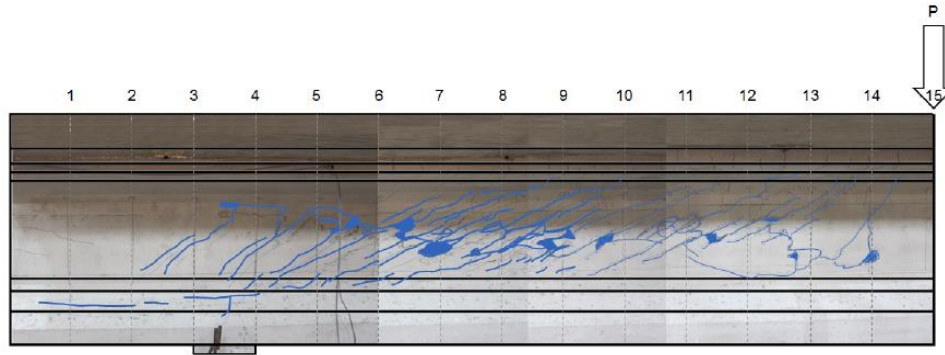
Girder with plastic duct after failure (Felan, 2013).
